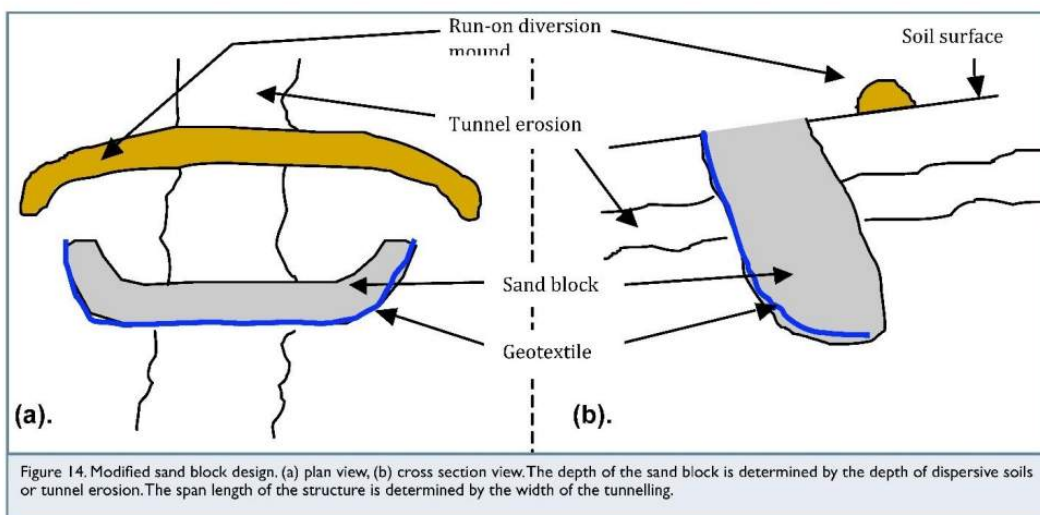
Modified sand block design. (a) plan view, (b) cross section view. The depth of the sand block is determined by the depth of dispersive soils or tunnel erosion. The span length of the structure is determined by the width of the tunnelling.
